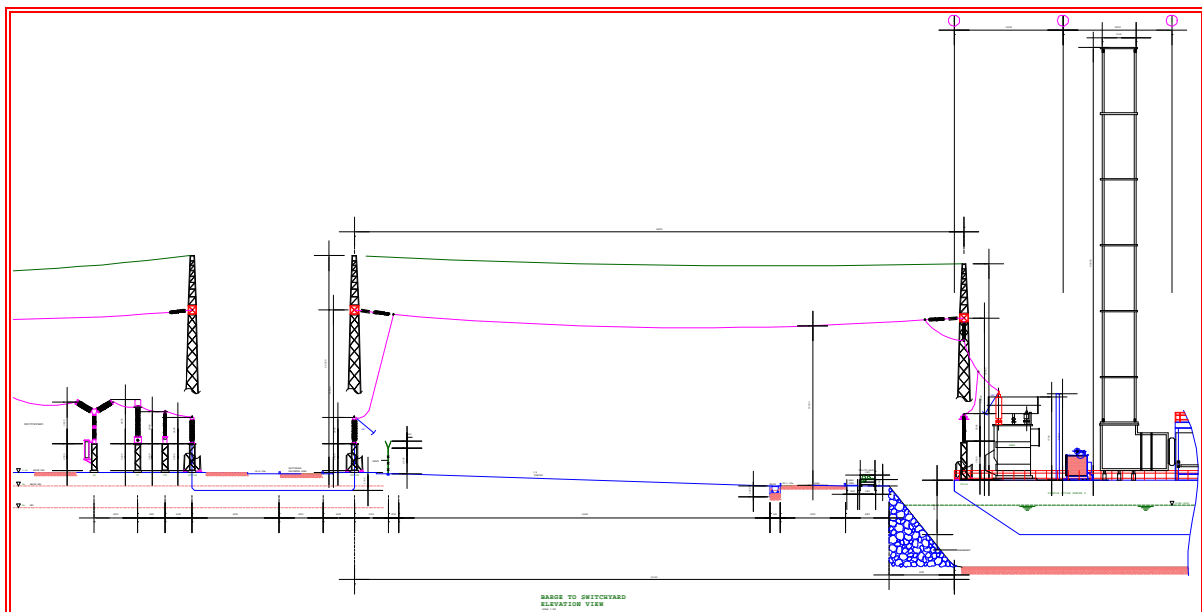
Detailed drawing of HV line connection from the barge to the switchyard
